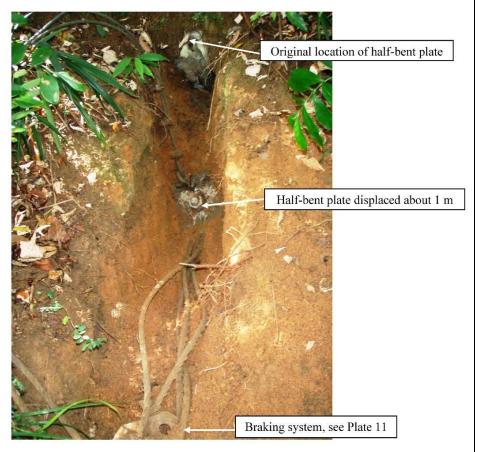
Anchor Bent Leading to Failure of the Front Part of Grout Block
